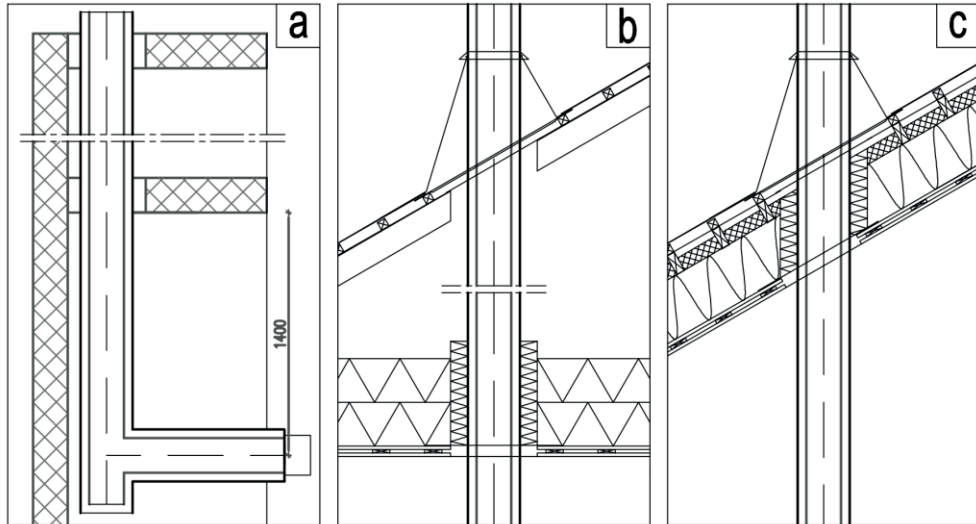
a) Test arrangement of metal chimneys. b) Installation example: Thermally-insulated ceiling and uninsulated roof. c) Installation example: Thermally-insulated roof.
